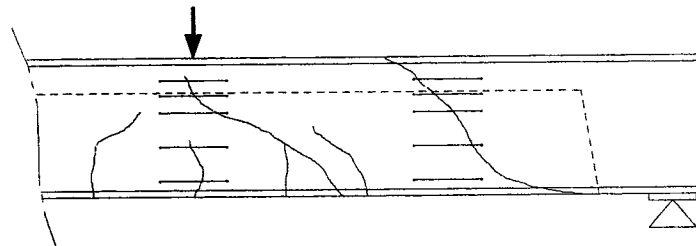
Cracking Growth of *Girder 1 East
